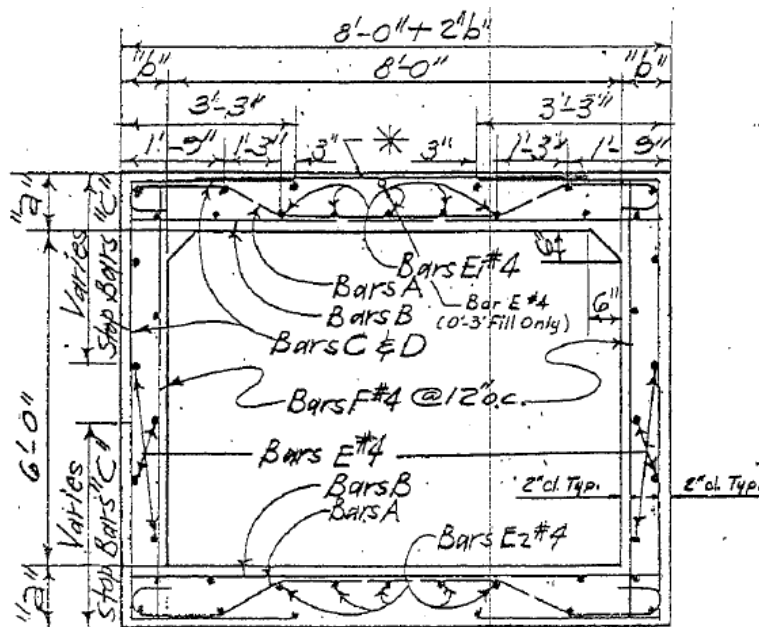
AEB Culvert at 175+70 Cross-Section (ALDOT n.d.b)
